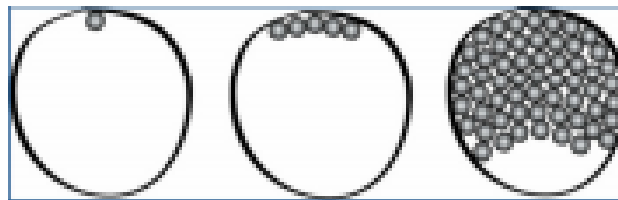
Cross-sections of multiple strands stay-cable manufacturing stages[79]
